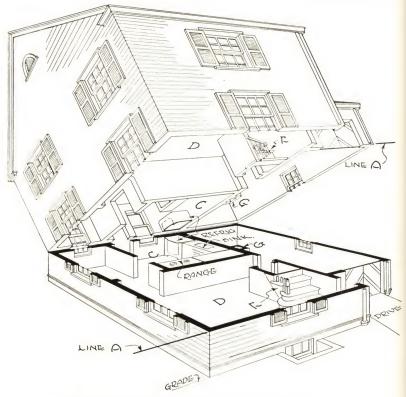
House of Fig. 30, Cut to Illustrate First-Floor Plan
